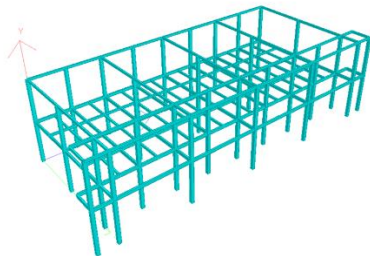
Structural Framing, Isometric View using STAAD Pro CONNECT
